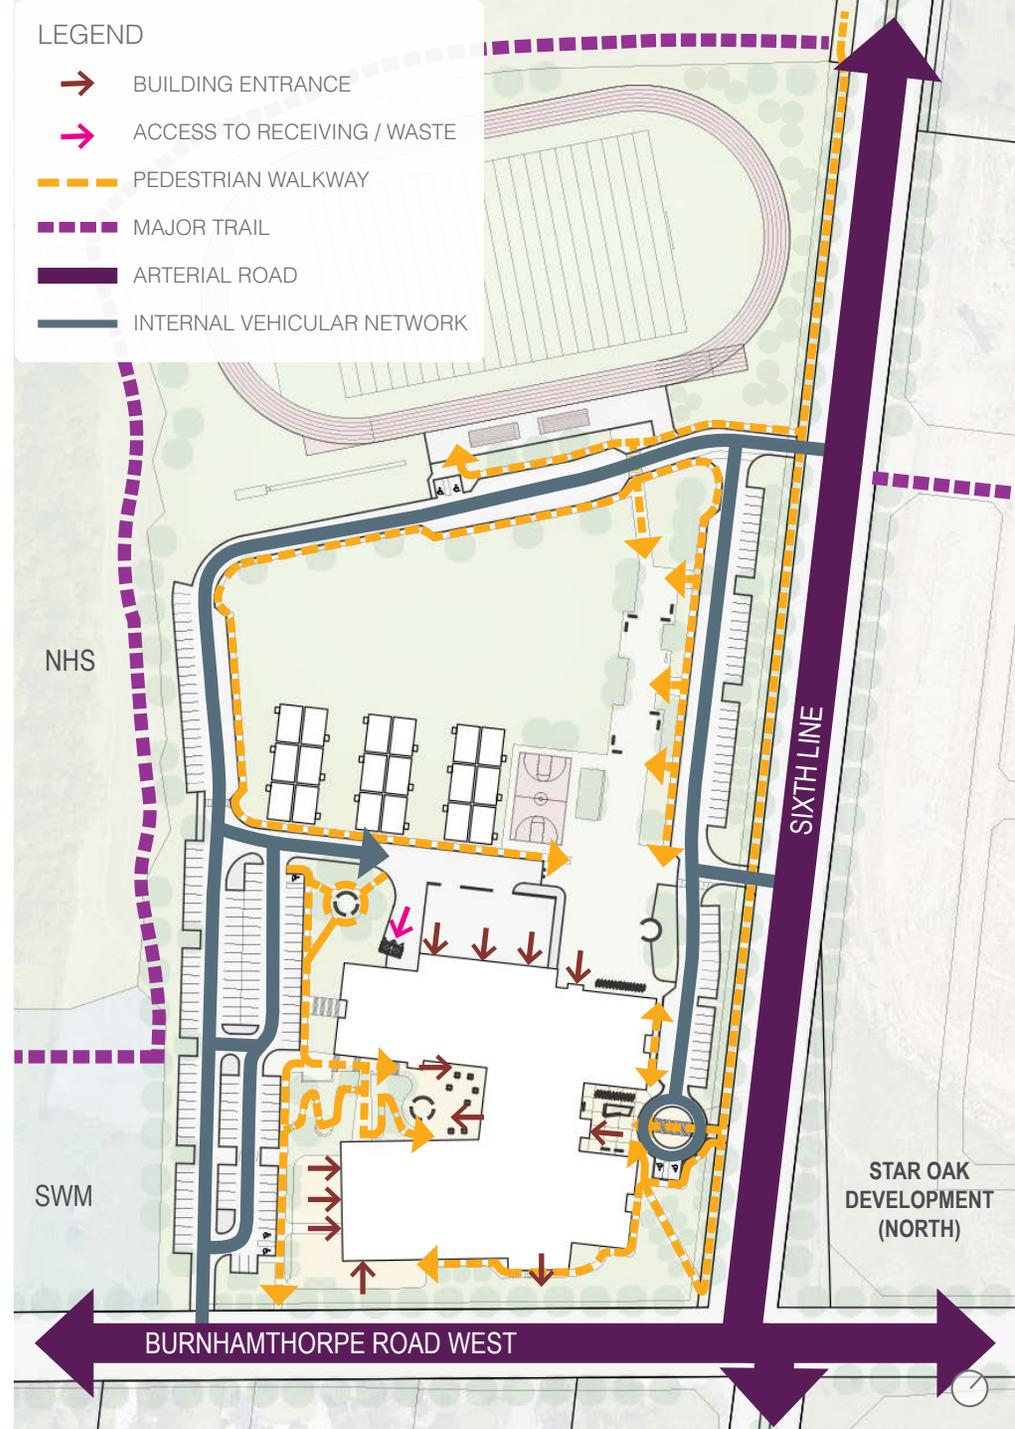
Sixth Oak Secondary School Conceptual Site Design Plan
